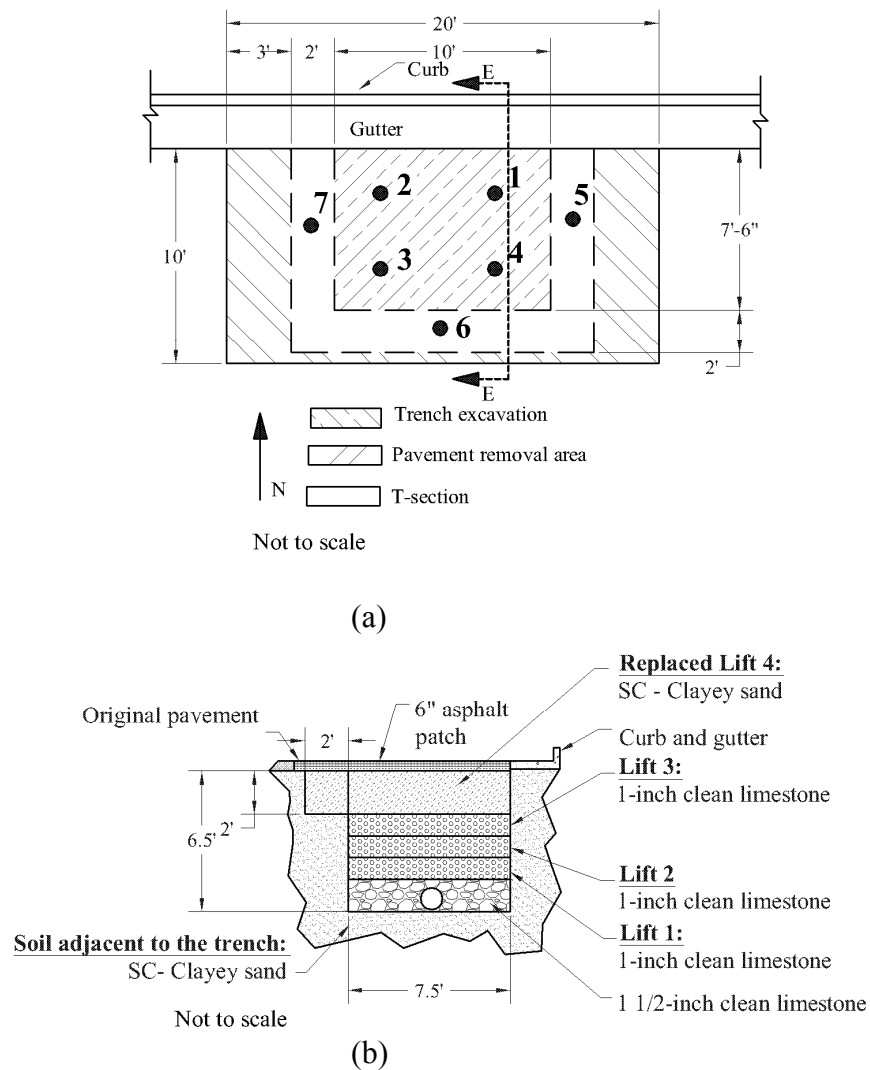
Location of test points in Trench E; cross-section of the trench
